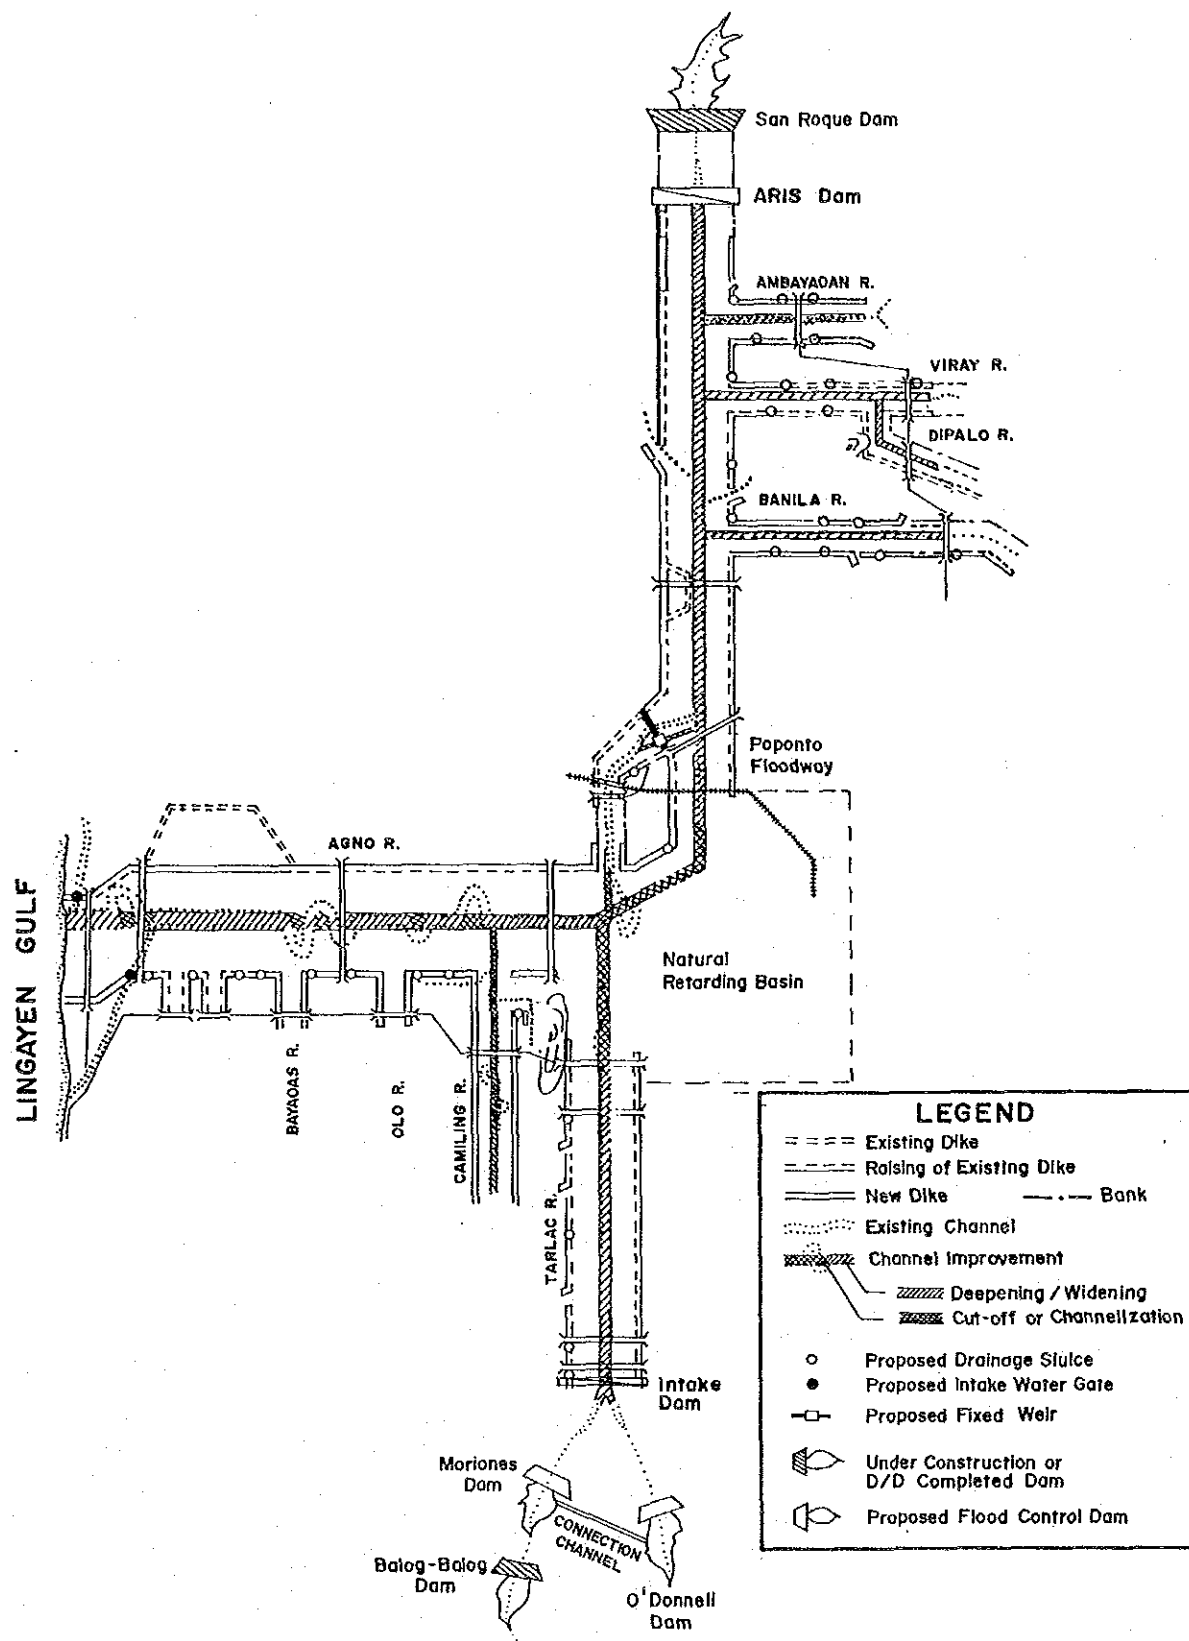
GENERAL LAYOUT OF AGNO RIVER IMPROVEMENT PLAN FOR FRAMEWORK PLAN
